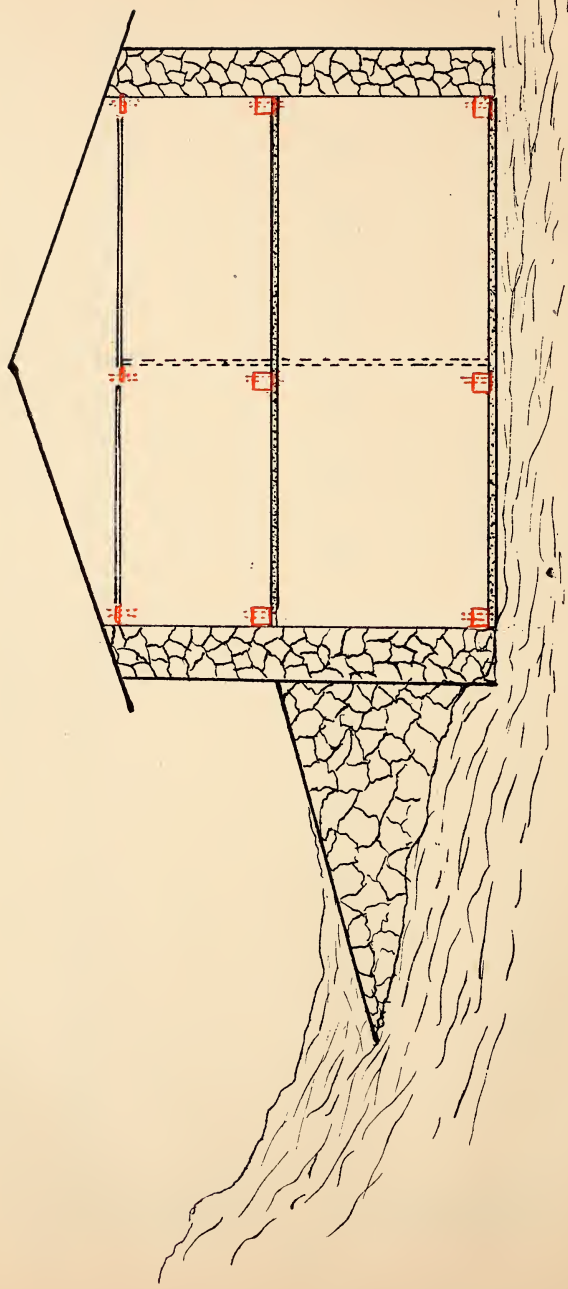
Cross-section of Mr. R. N. Barber's apple house.
